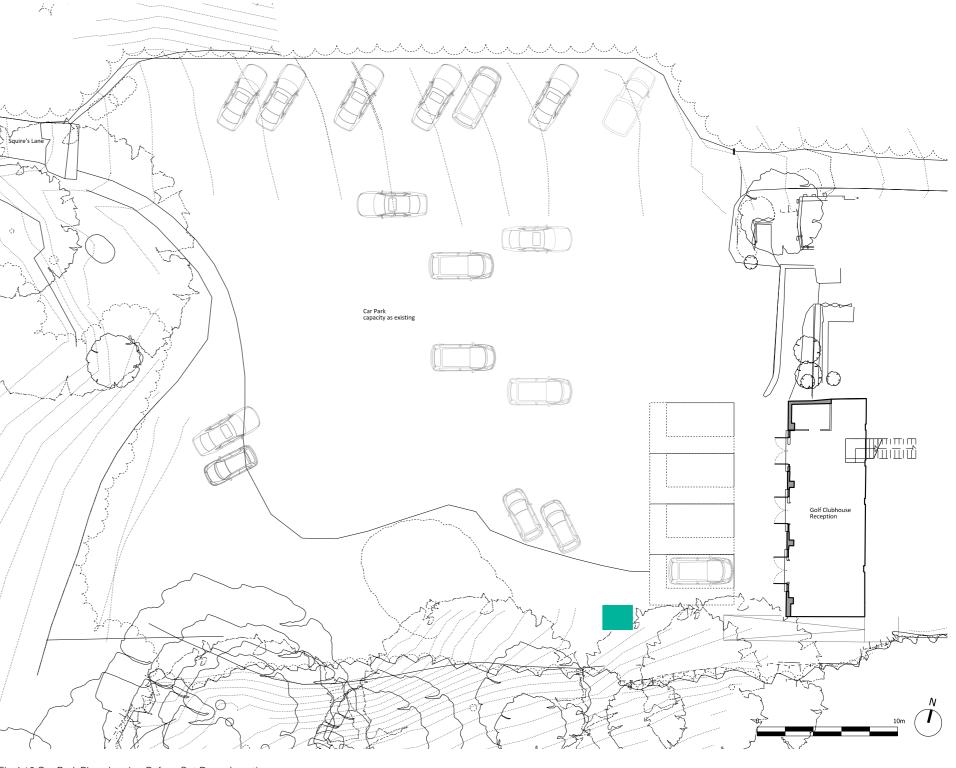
Car Park Plan showing Refuse Set-Down Locations
